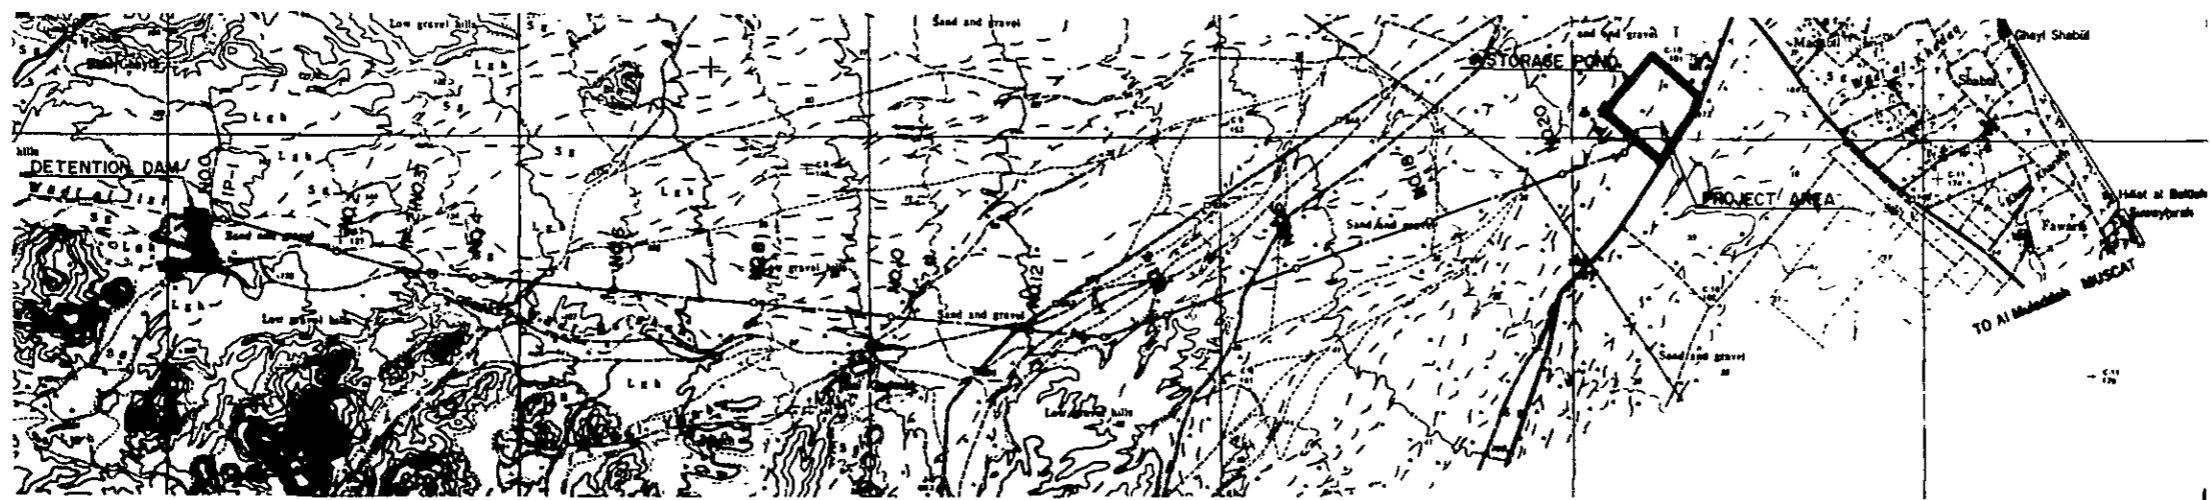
DESIGN OF CONVEYANCE FACILITY AND STORAGE POND
